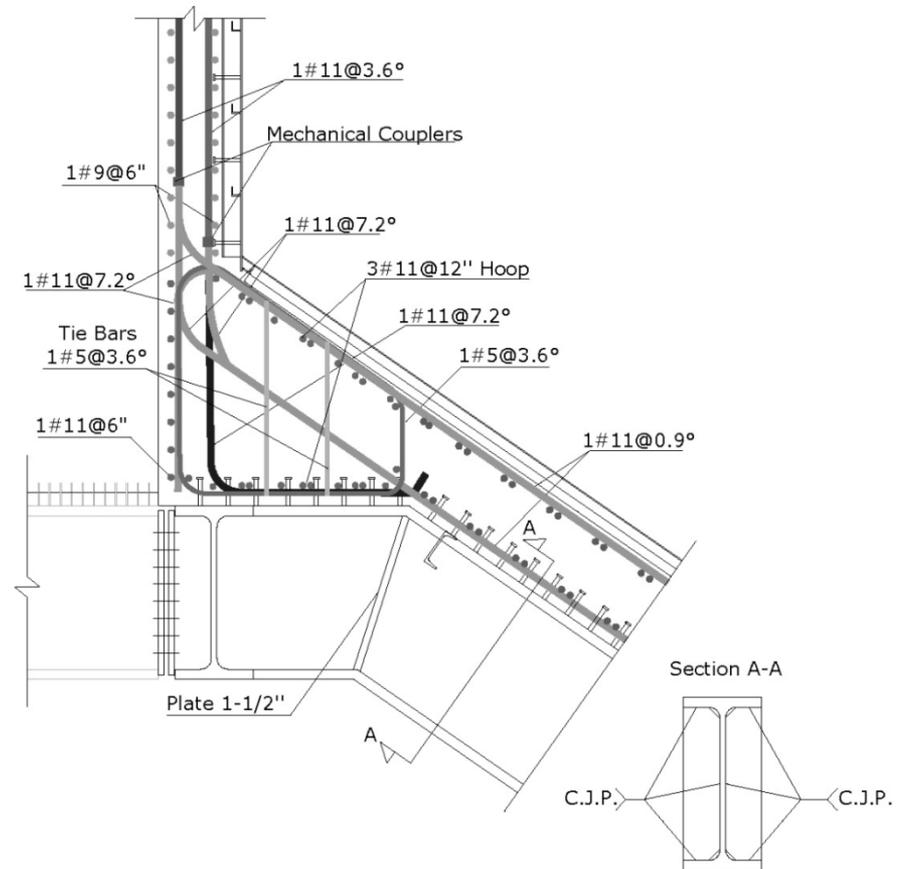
H.5-11 Sheet 5 shows the knuckle region and a portion of the exterior wall. It is consistent with the reinforcement design defined in Table 3H.5-9 Sheet 3
